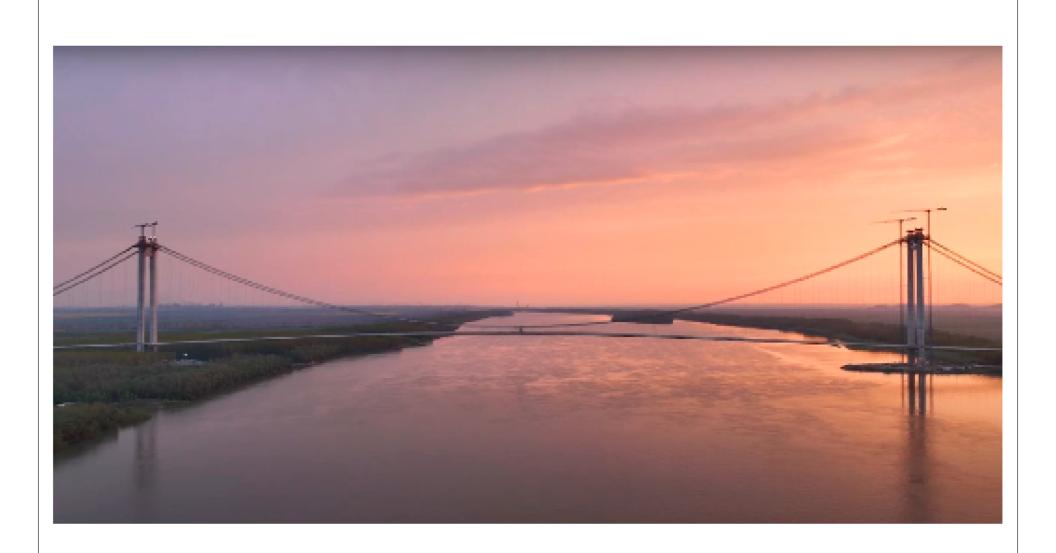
Suspension Bridge Example Fenton Parkway Bridge Project EIR
